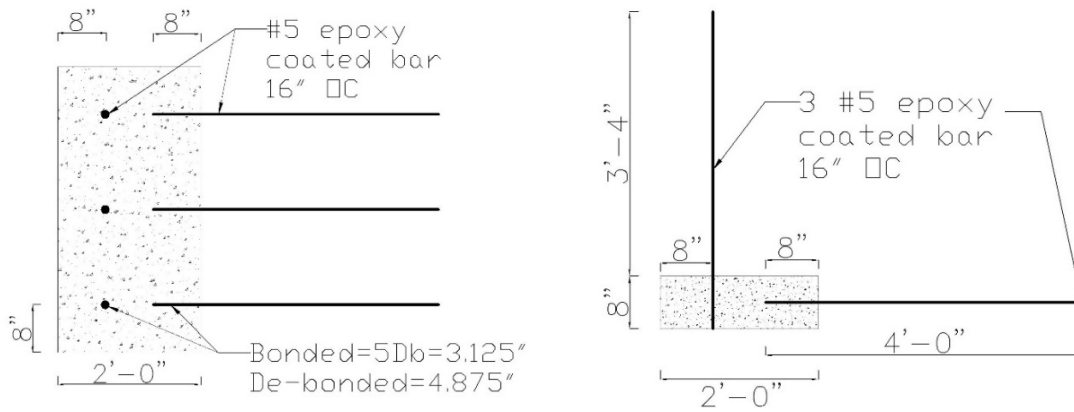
Bond strength test specimen schematic plan view (left) and elevation view (right)
